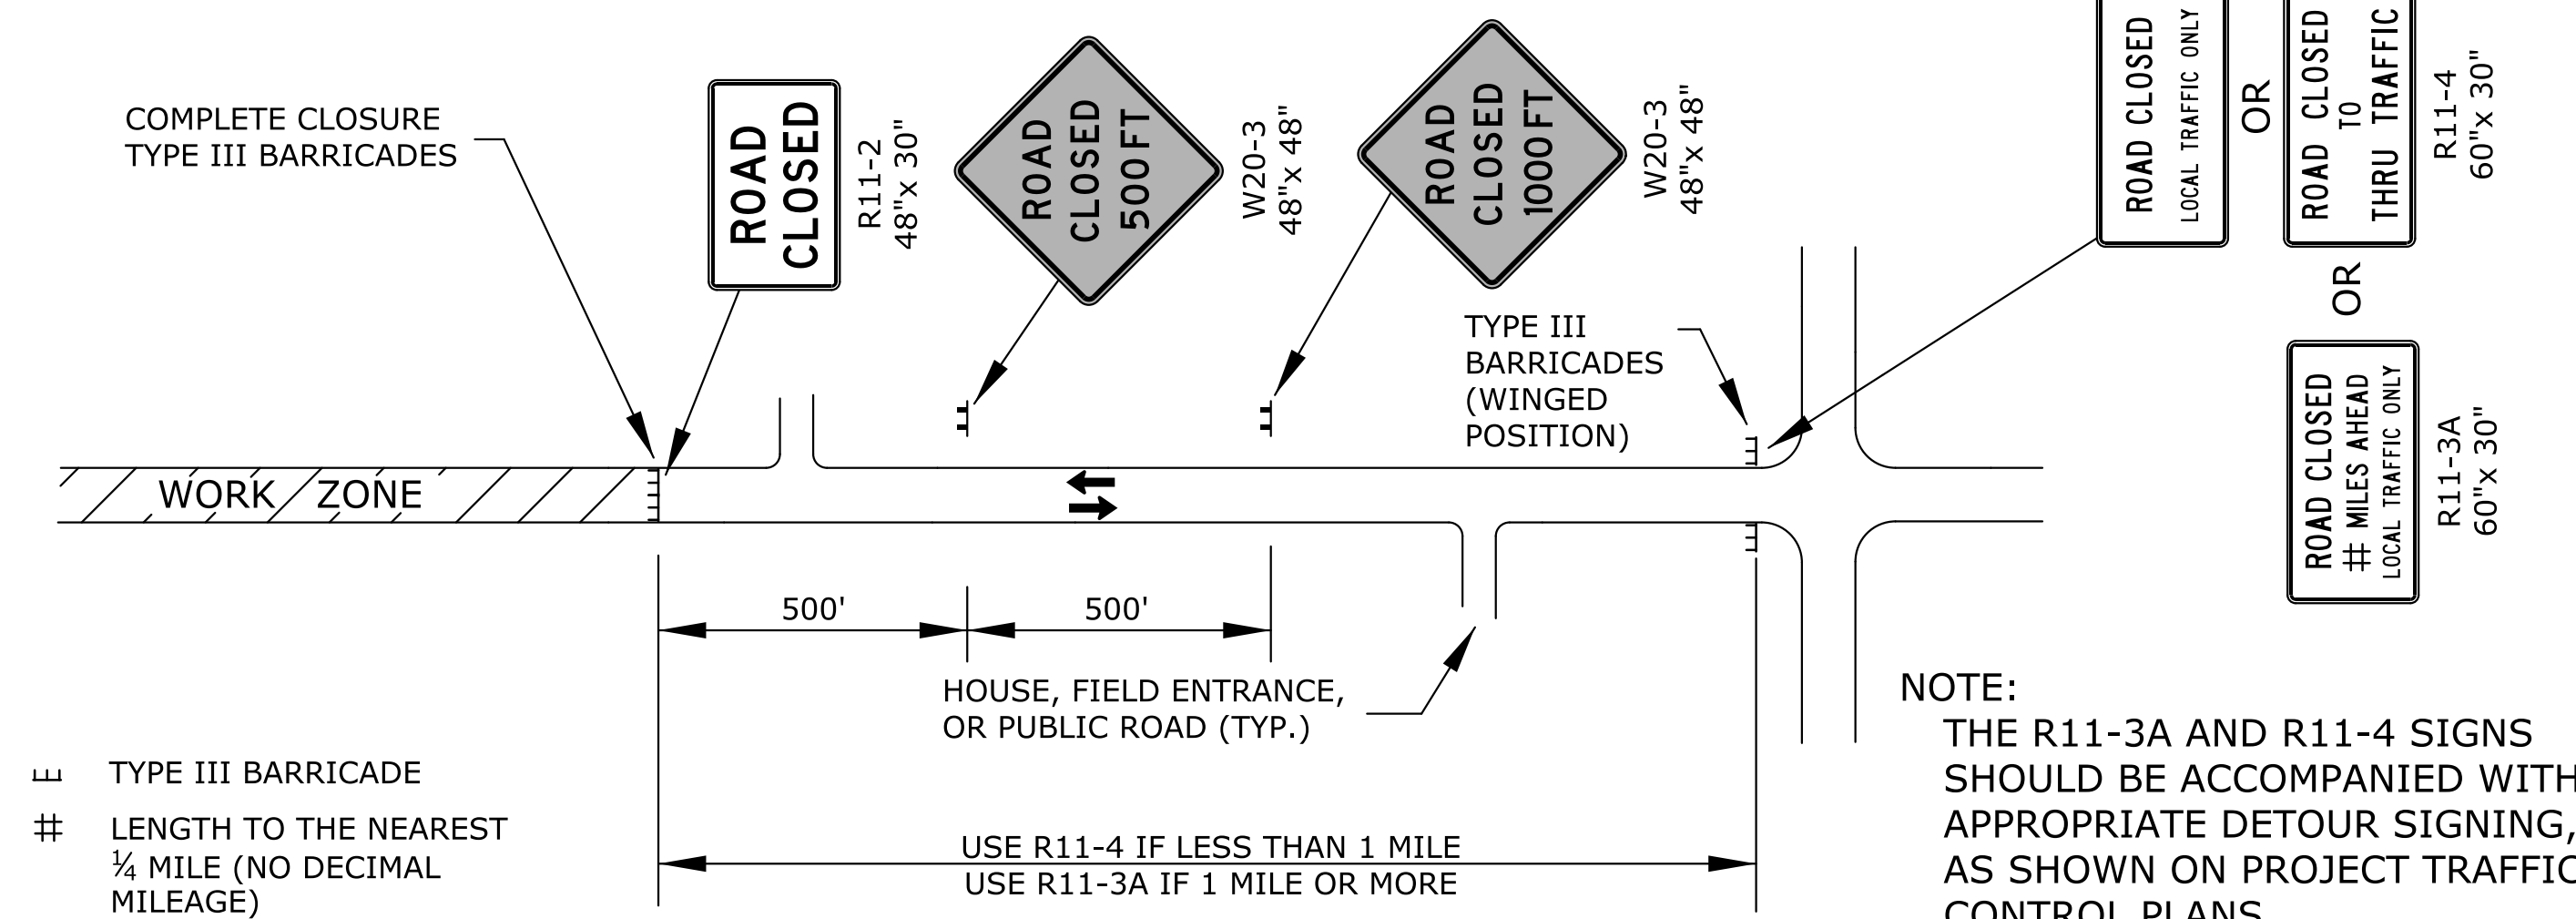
TYPICAL SIGNING FOR ROAD CLOSURE
